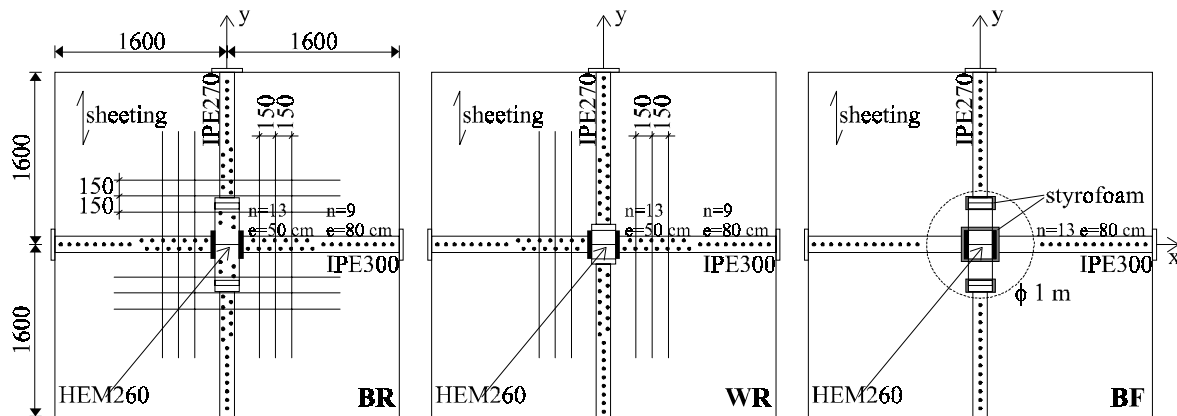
Slab reinforcements and connectors layout of specimens BR, WR and BF of Darmstadt test
